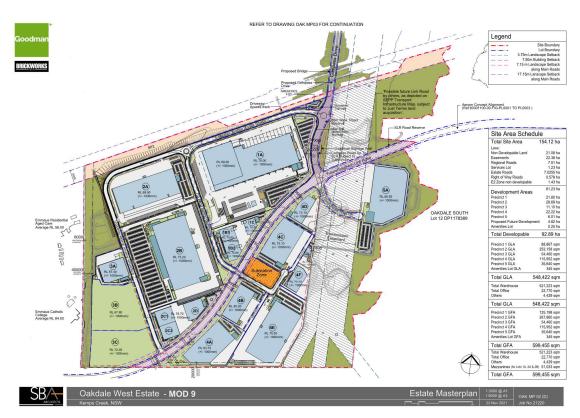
Amended Estate Masterplan (Source: SBA Architects)
